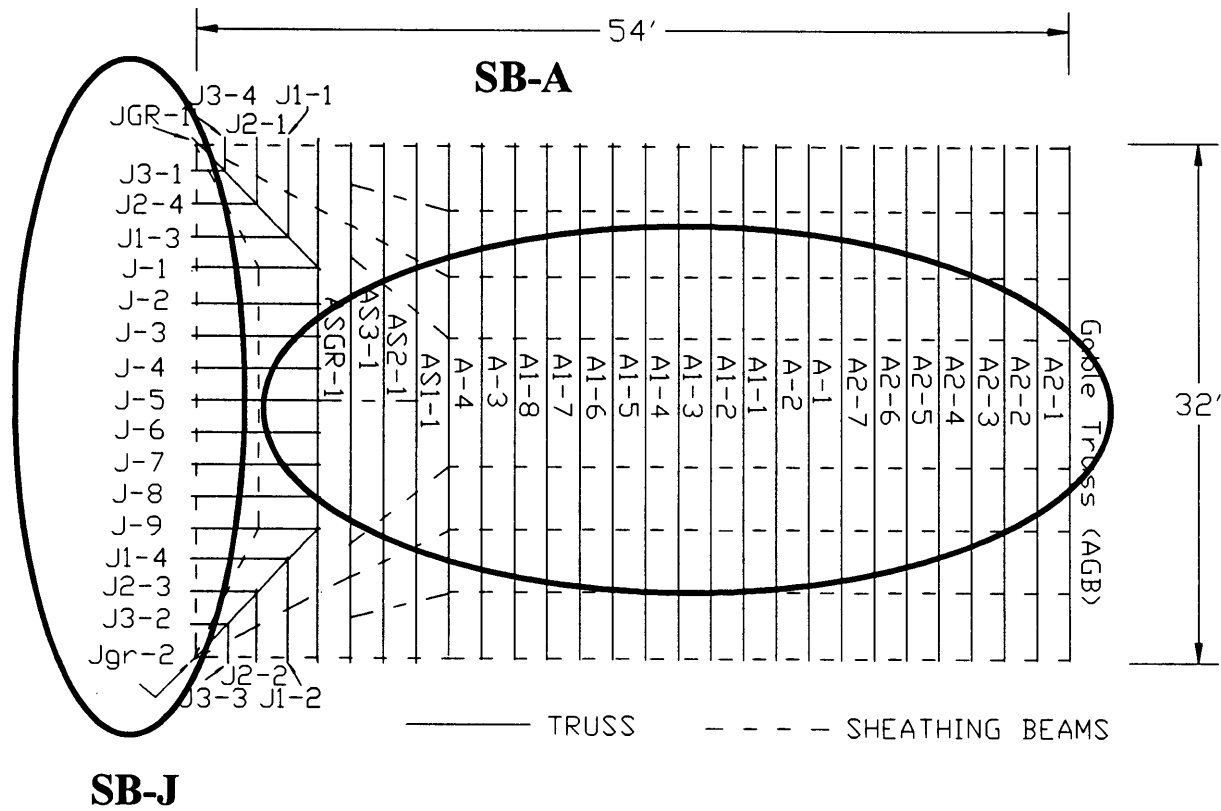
Roof Truss Sub-Assembly (Plan View)
